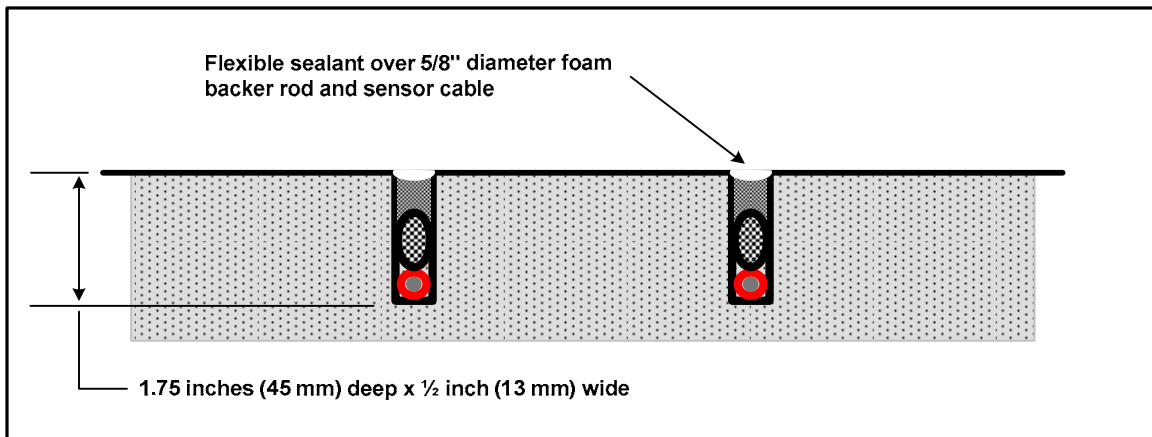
Sensor Cable in Concrete or Asphalt over 4 inch (10 cm) thick
